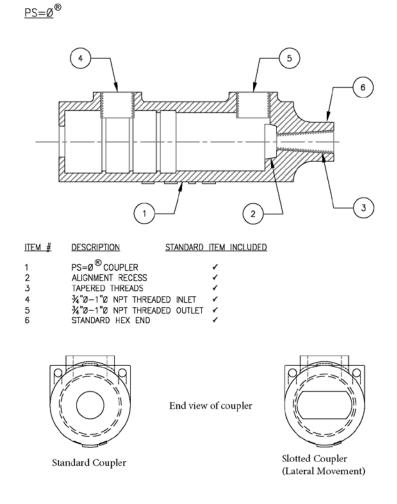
PS=Ø[®] STEEL REINFORCEMENT SPLICE SYSTEM - BODY DETAILS
